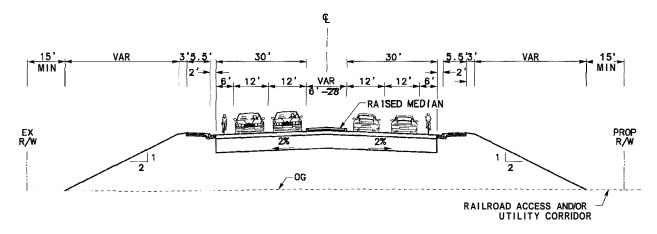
Alternative 1 – Overhead with Side Slopes (Looking East)
